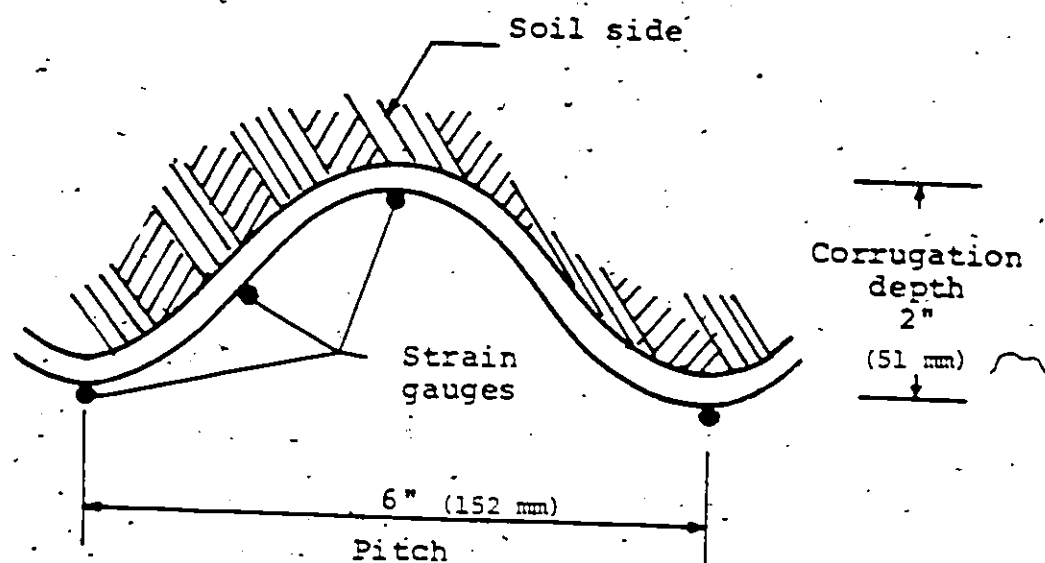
Typical Strain Gauge Positions at One Location of White Ash Creek Structure
